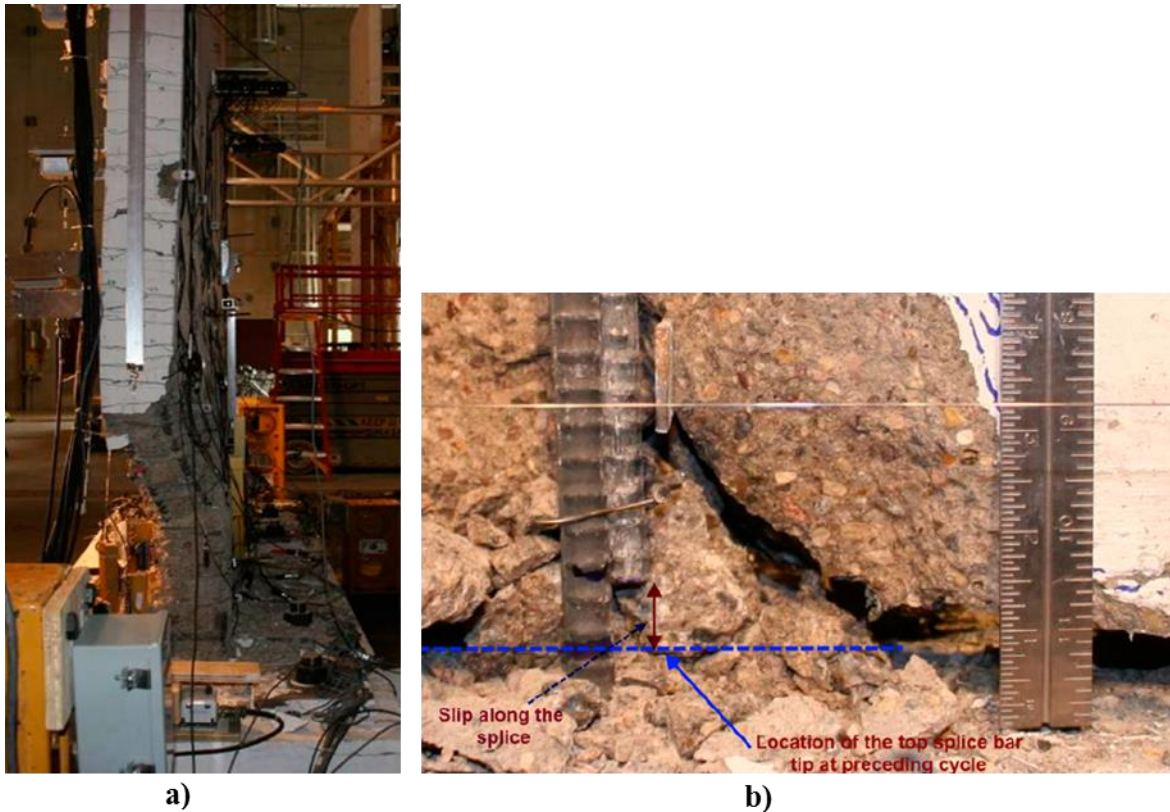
Aaleti et al. (2013) observed damage – a) Specimen RWC out-of-plane buckling, and b) Specimen RWS lap splice failure
